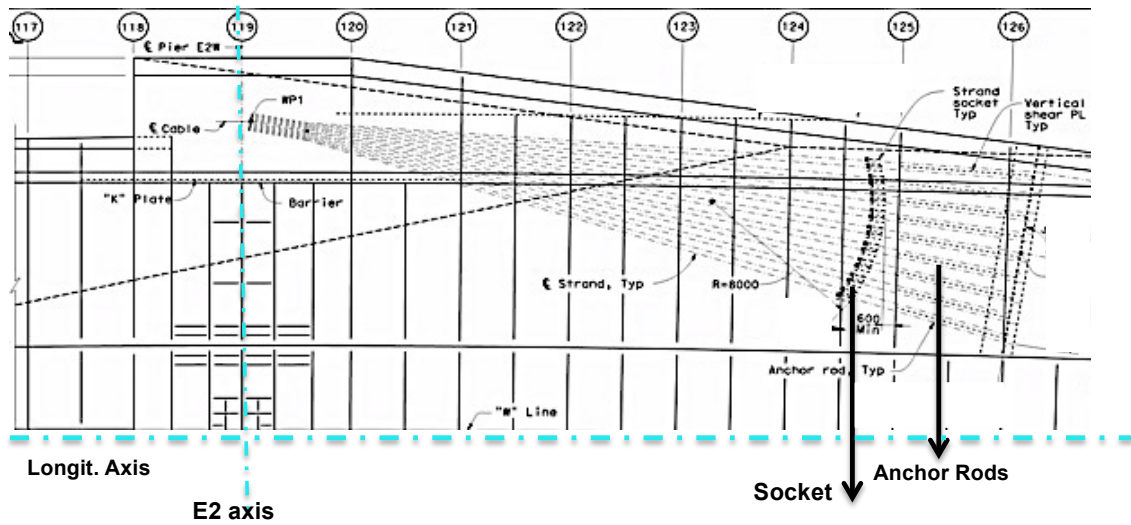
Plan view of the east deck cable anchorage (Ref.: Caltrans drawings 734/1204).
